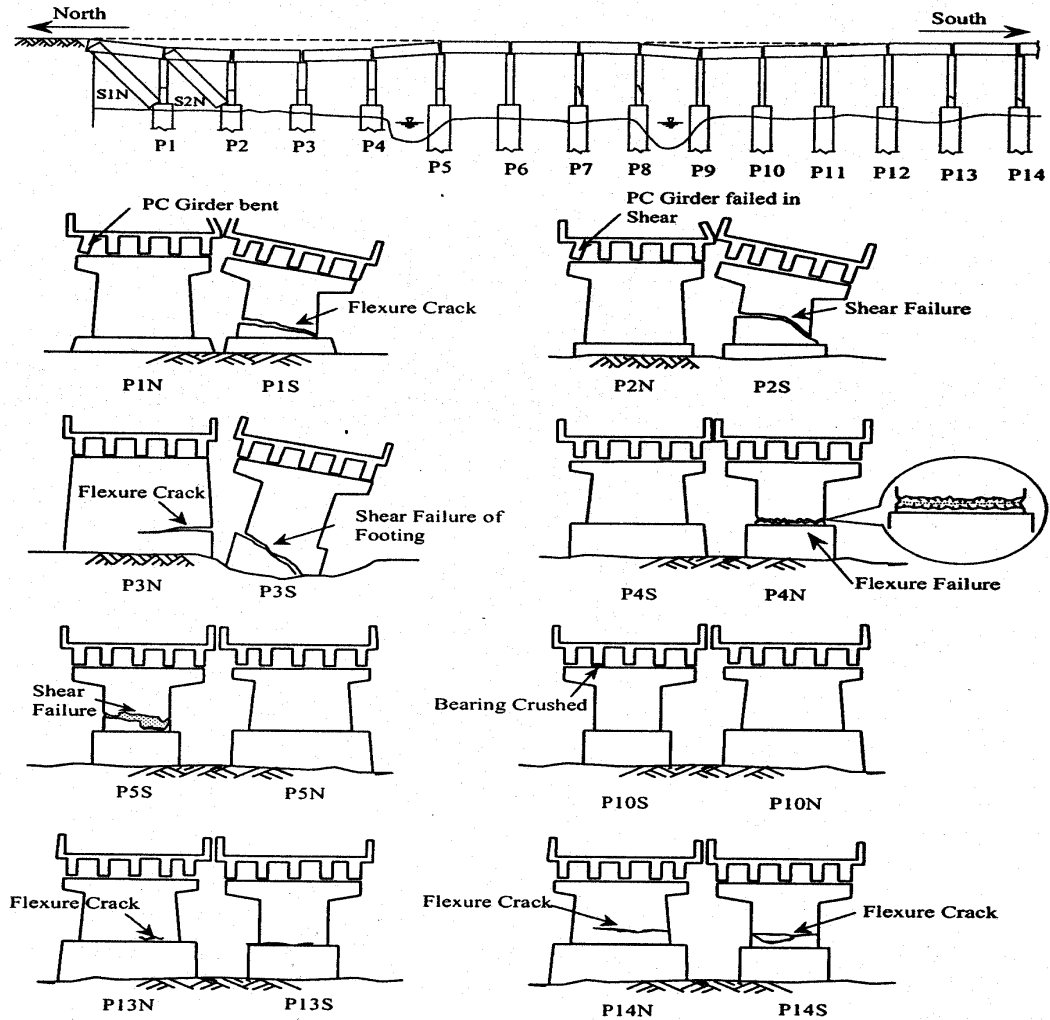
Damaged Piers of the Wu-Shi Bridge.
